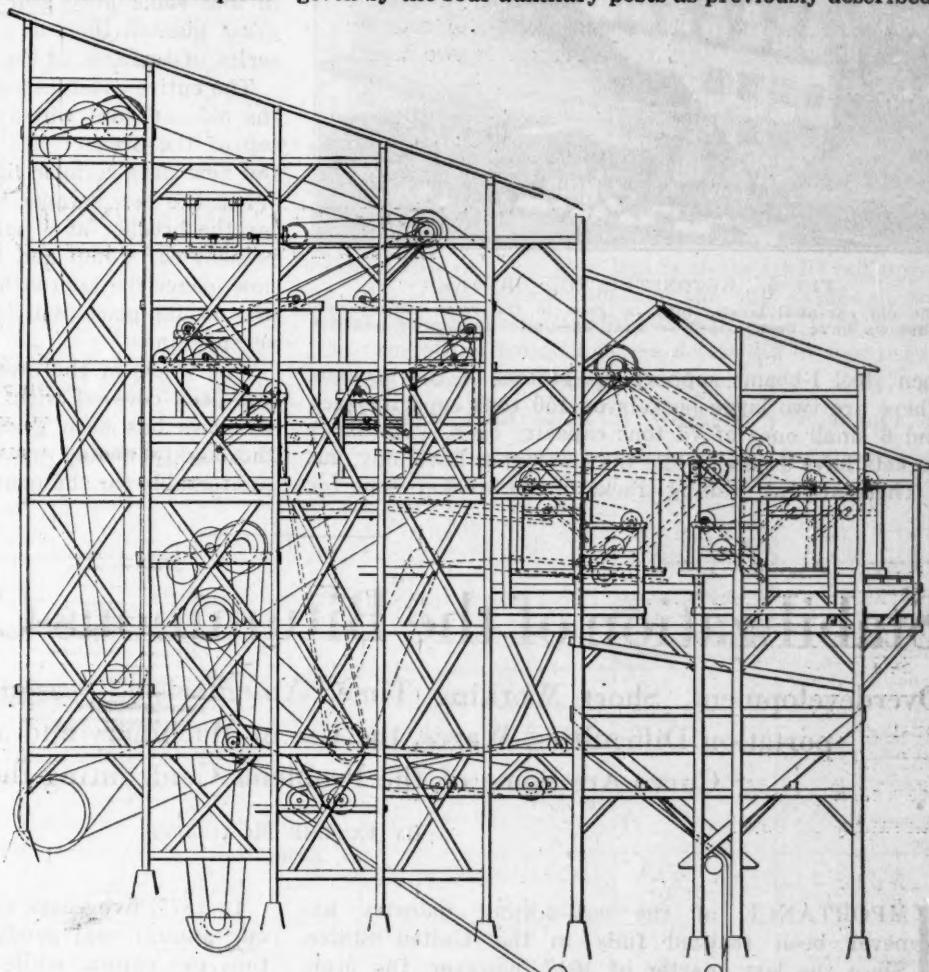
ARRANGEMENT OF MACHINERY IN OLD WASHER
